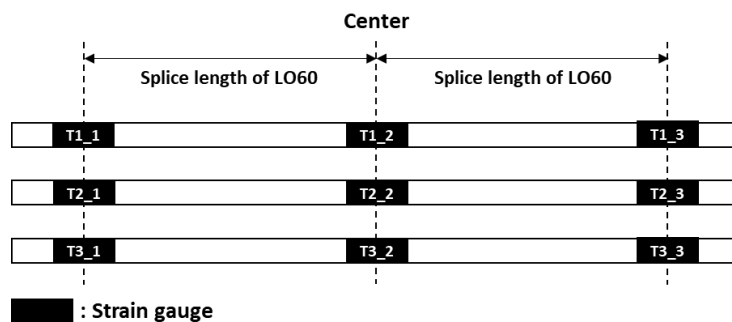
Rebar strain gauge locations of LX60 specimen
